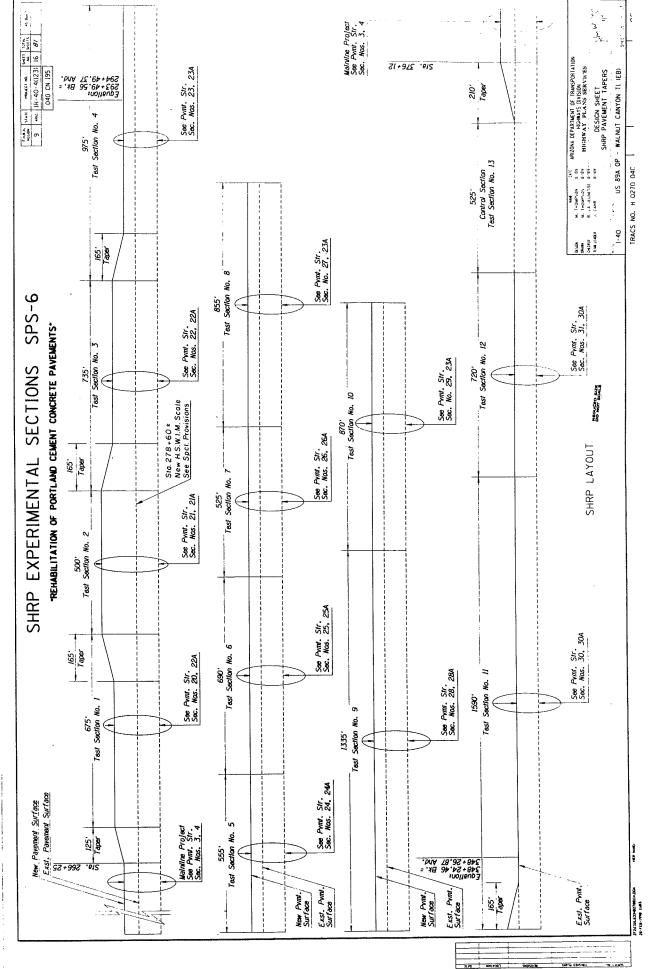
TEST SECTION LAYOUT SEQUENCE
